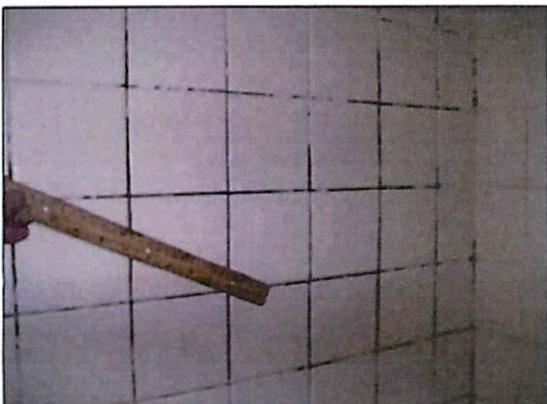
South wing restroom, shower area, typical fungal growth on tile grout
